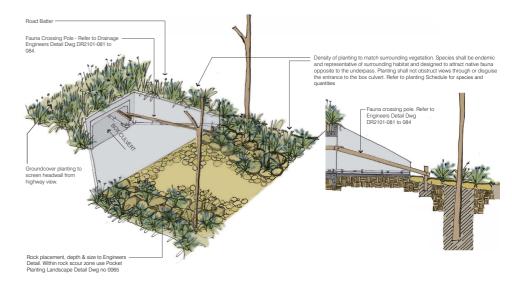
Typical landscape treatment for box culvert fauna crossing
